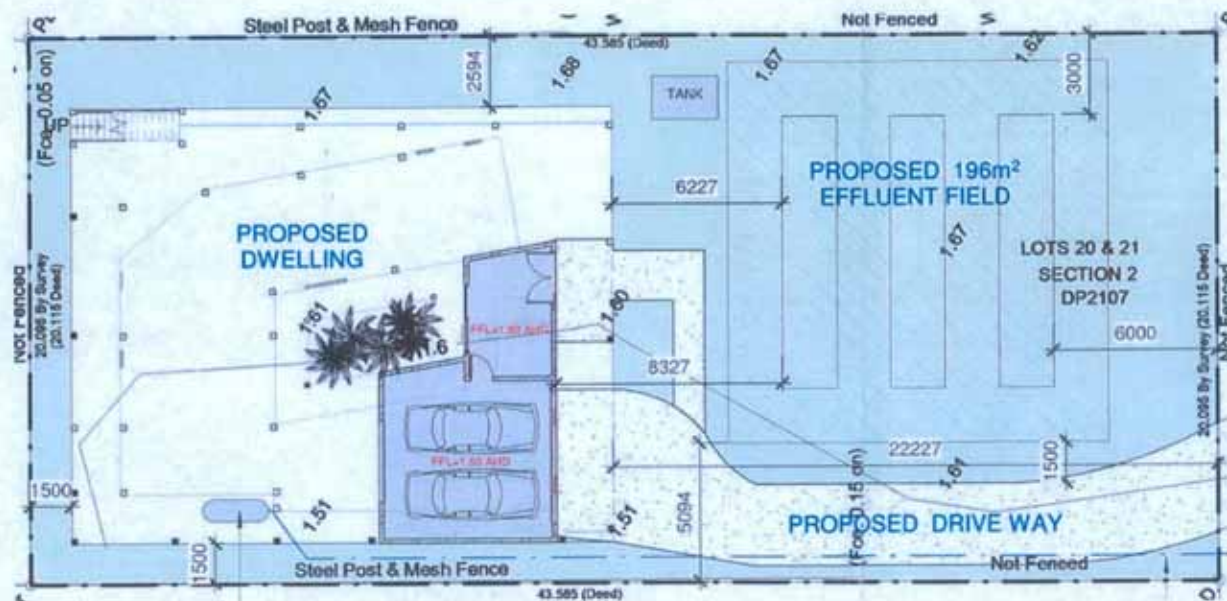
Site Plan, 5 Carrington Street Palmers Island.
